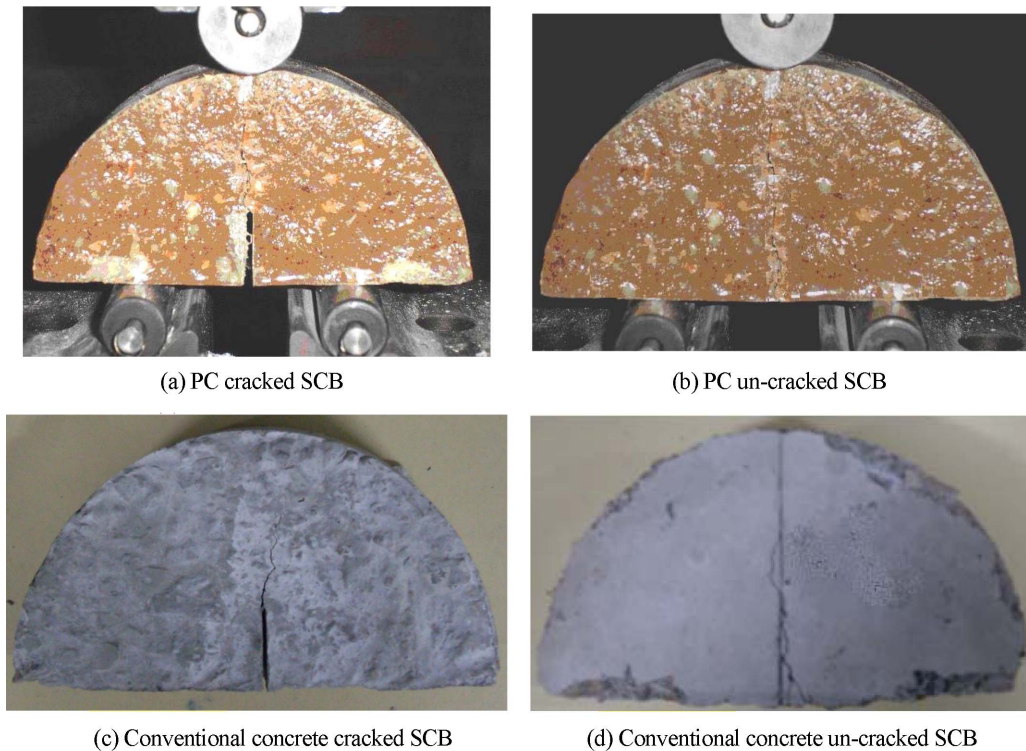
Typical fracture paths observed for the cracked and un-cracked SCB specimens
